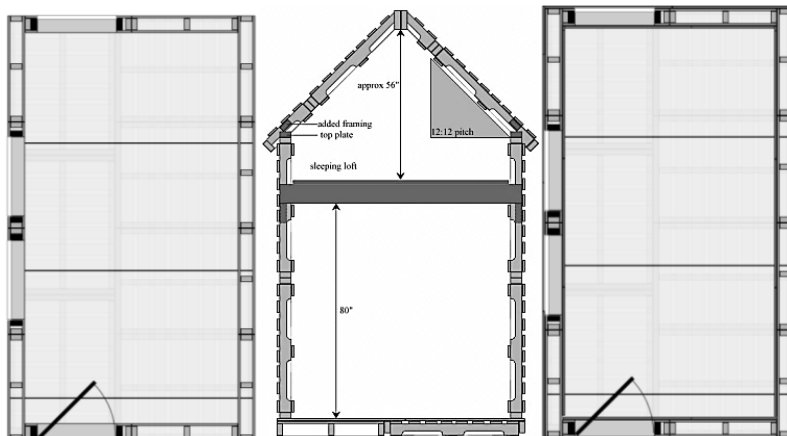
Step 4 & 5 in a pallet house (<http://www.tinypallethouse.com>).
